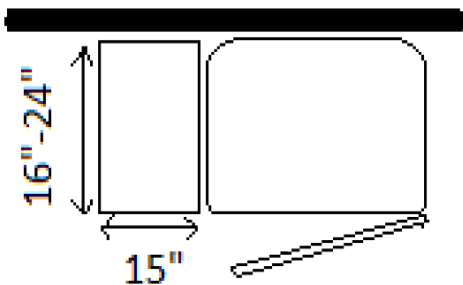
Typical Minimum Dimensions for Counter Adjacent to Refrigerator
